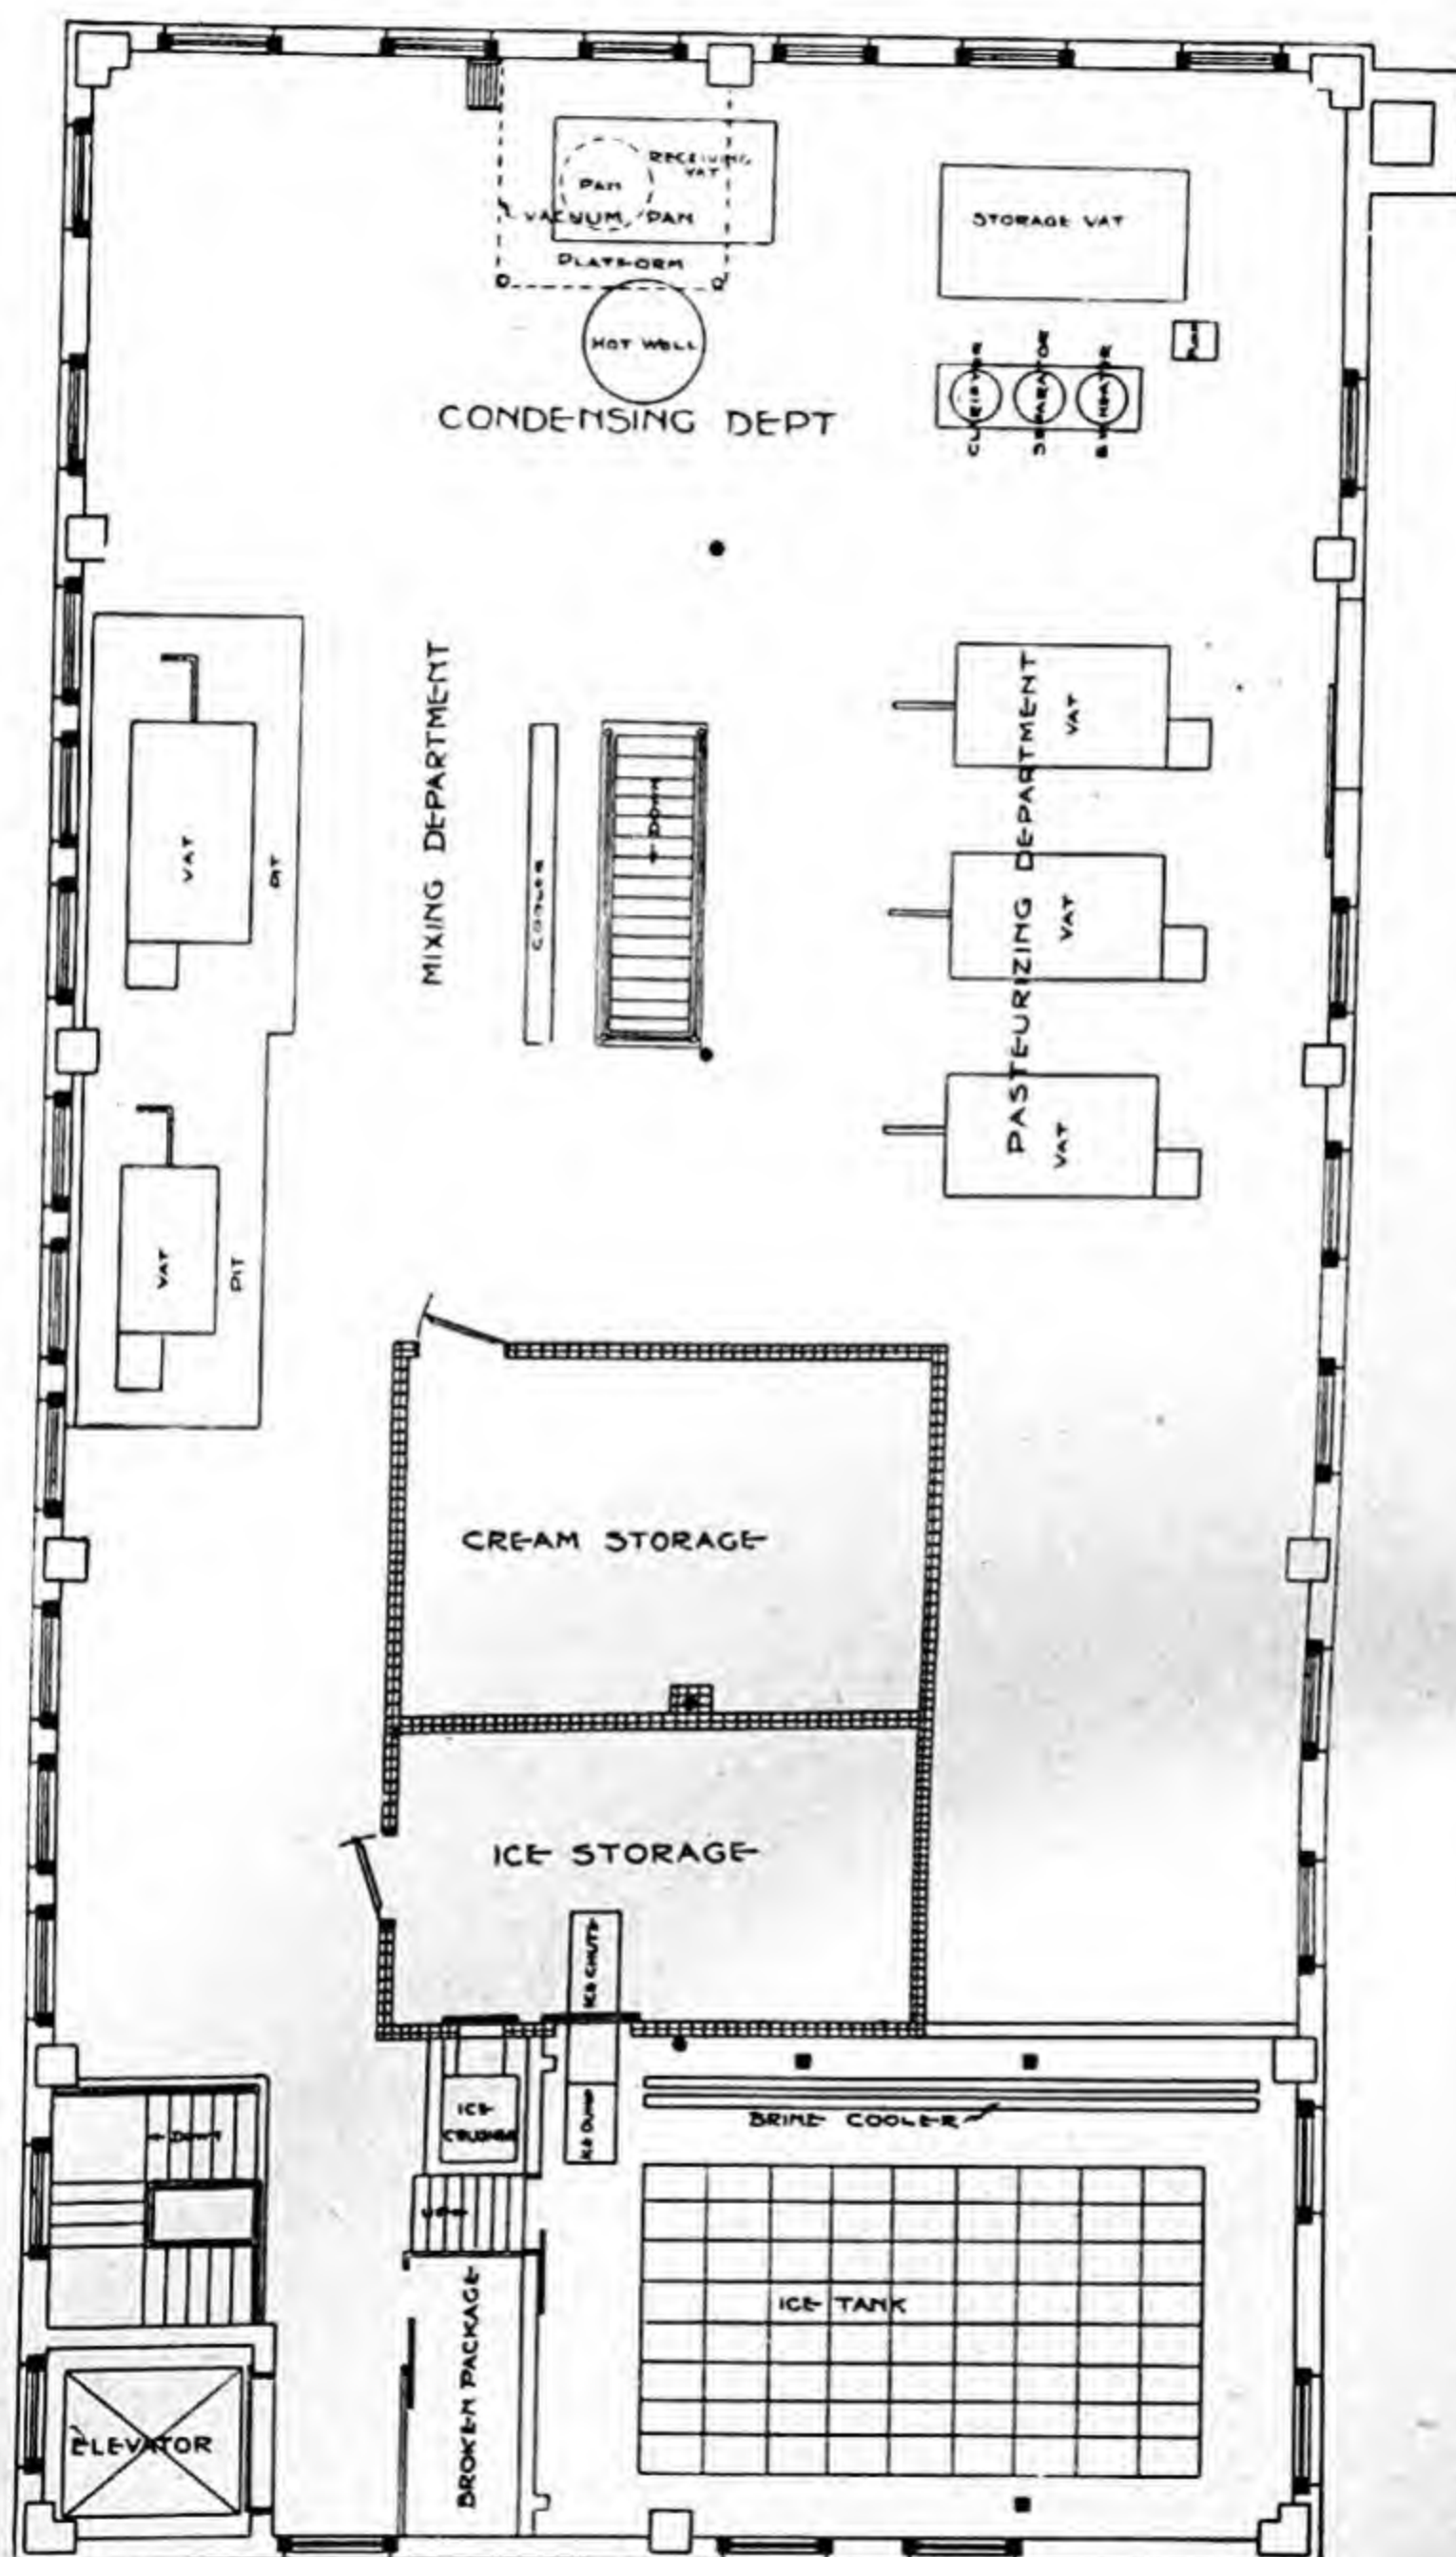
Second Floor Plan of Typical Creamery and Dairy Plant.
